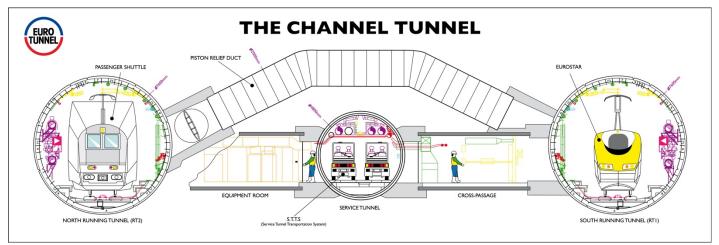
Tunnel System of the Eurotunnel (Source: Eurotunnel)
